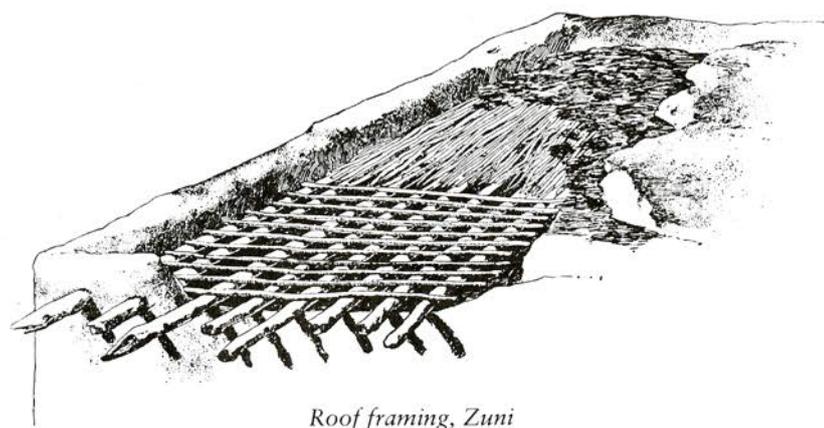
Roof constructive system in Zuni. Sistema constructivo de una cubierta en Zuni.
